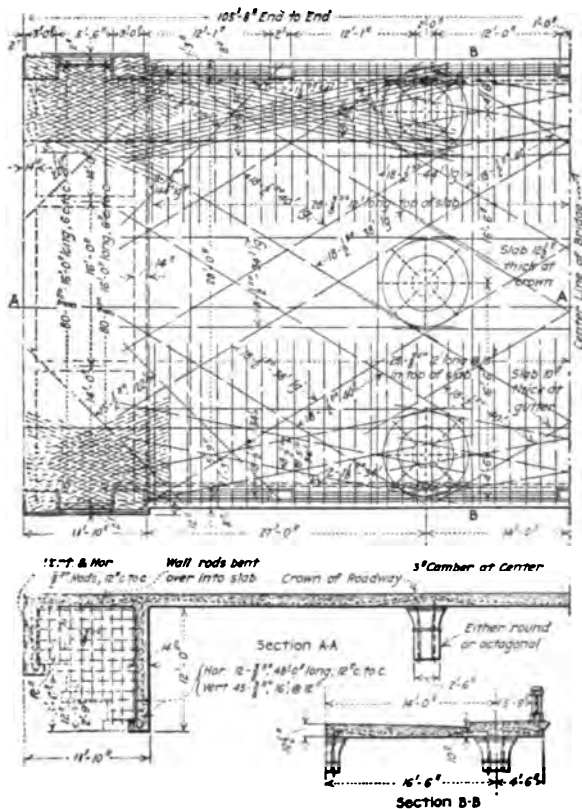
Cantilever flat-slab bridge on Mississippi River Boulevard, St. Paul, Minn.
